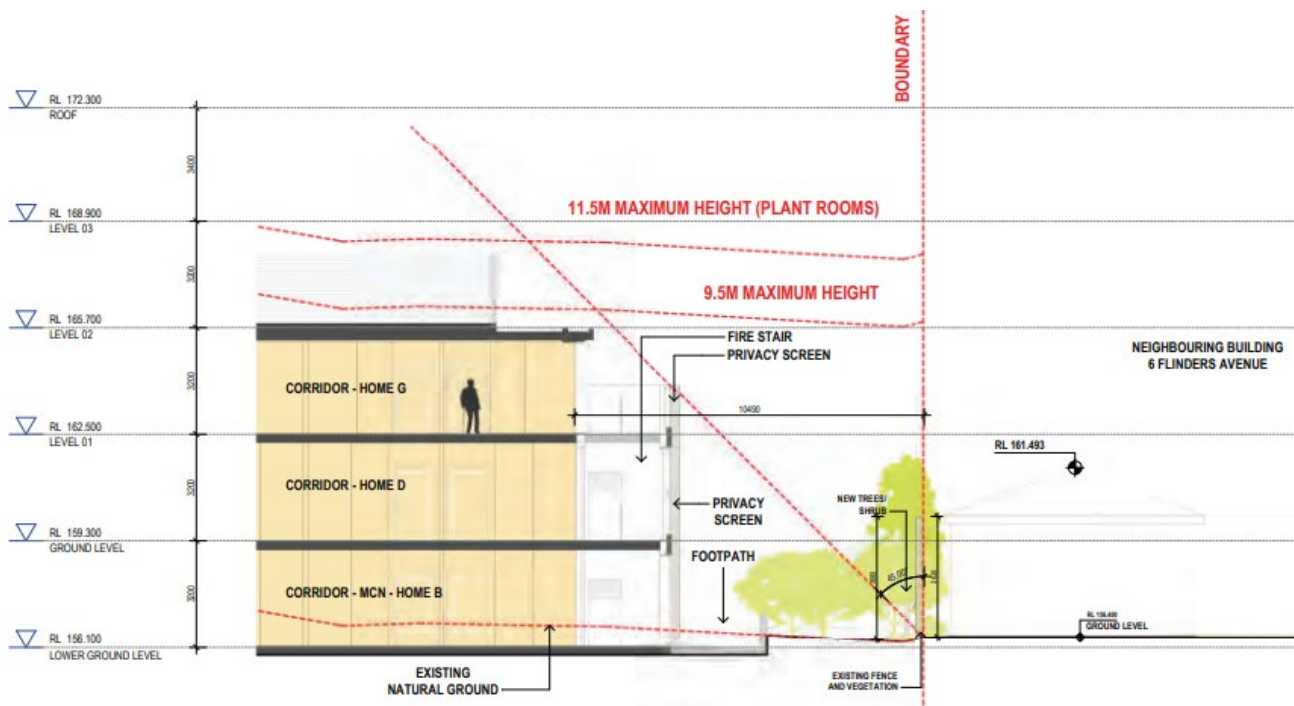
| Section plan demonstrating relationship between the proposal and boundary facing 6 Flinders Avenue
